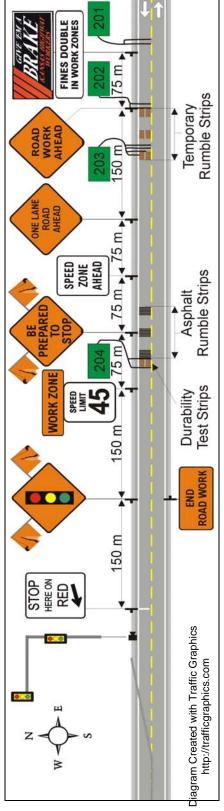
Westbound Approach at Orange Rumble Strip Test Site
